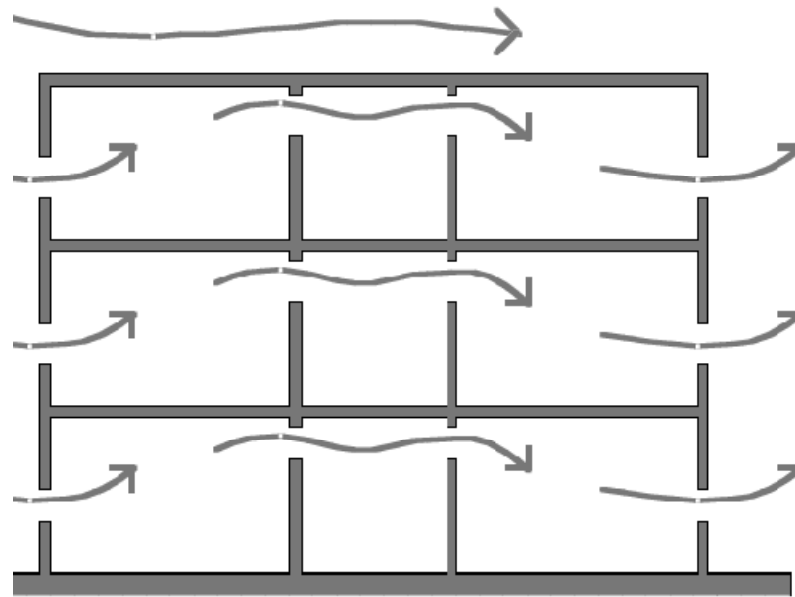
Schematic showing a wind-driven cross ventilation arrangement
